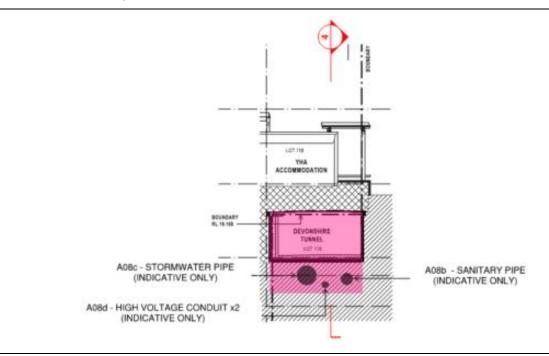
Cross-Section Elevation View of Devonshire Street Tunnel' (BVN Dwg. AR-23D-GXX-04[2])
